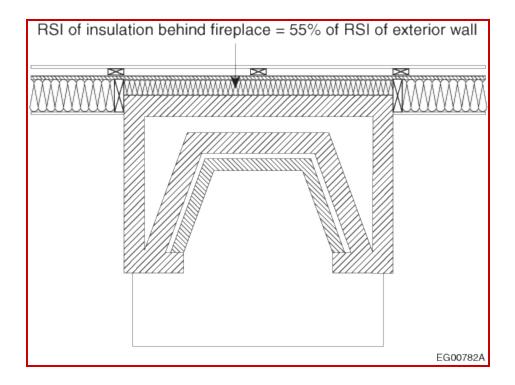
(3)-B] A-9.36.2.5.(3)-B Masonry fireplace insulated within plane of insulation of exterior wall
